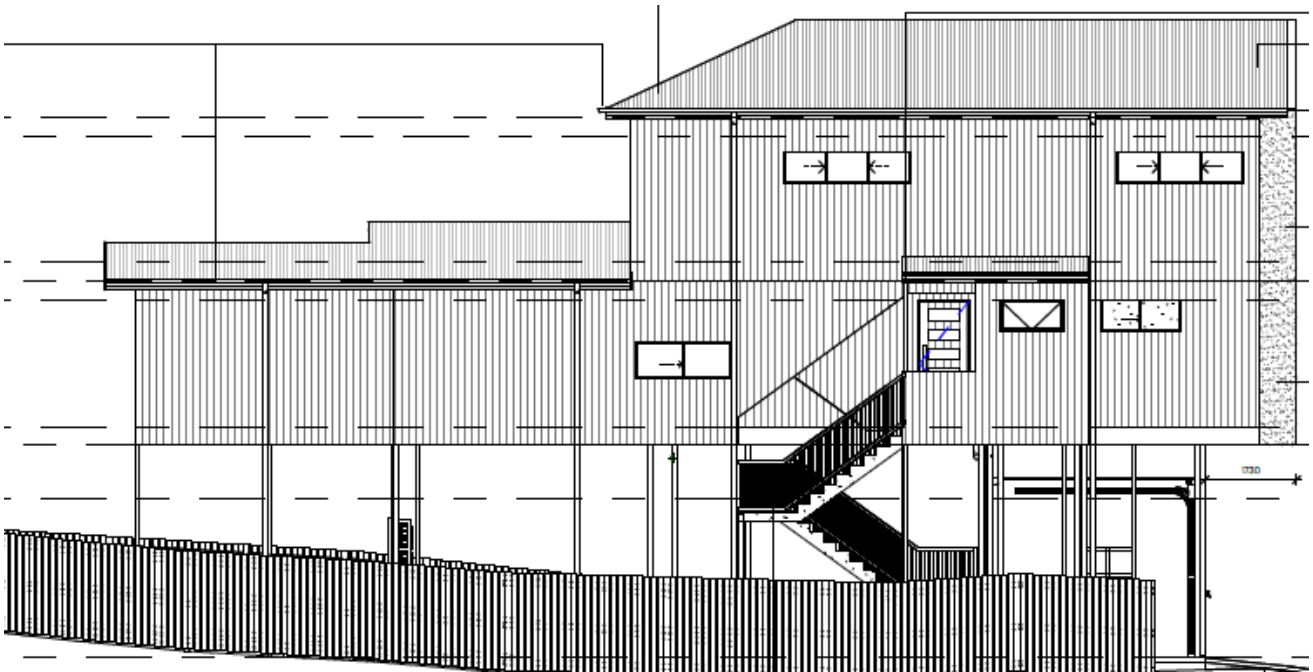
The proposed dwelling at 91 Munro Street, which is currently under assessment.
